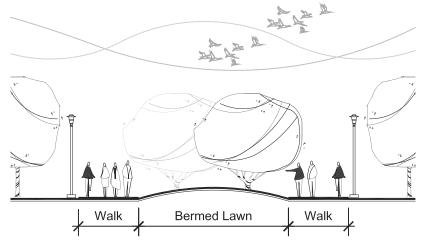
SECTION - PROPOSED JACKRABBIT GREEN CORRIDOR
